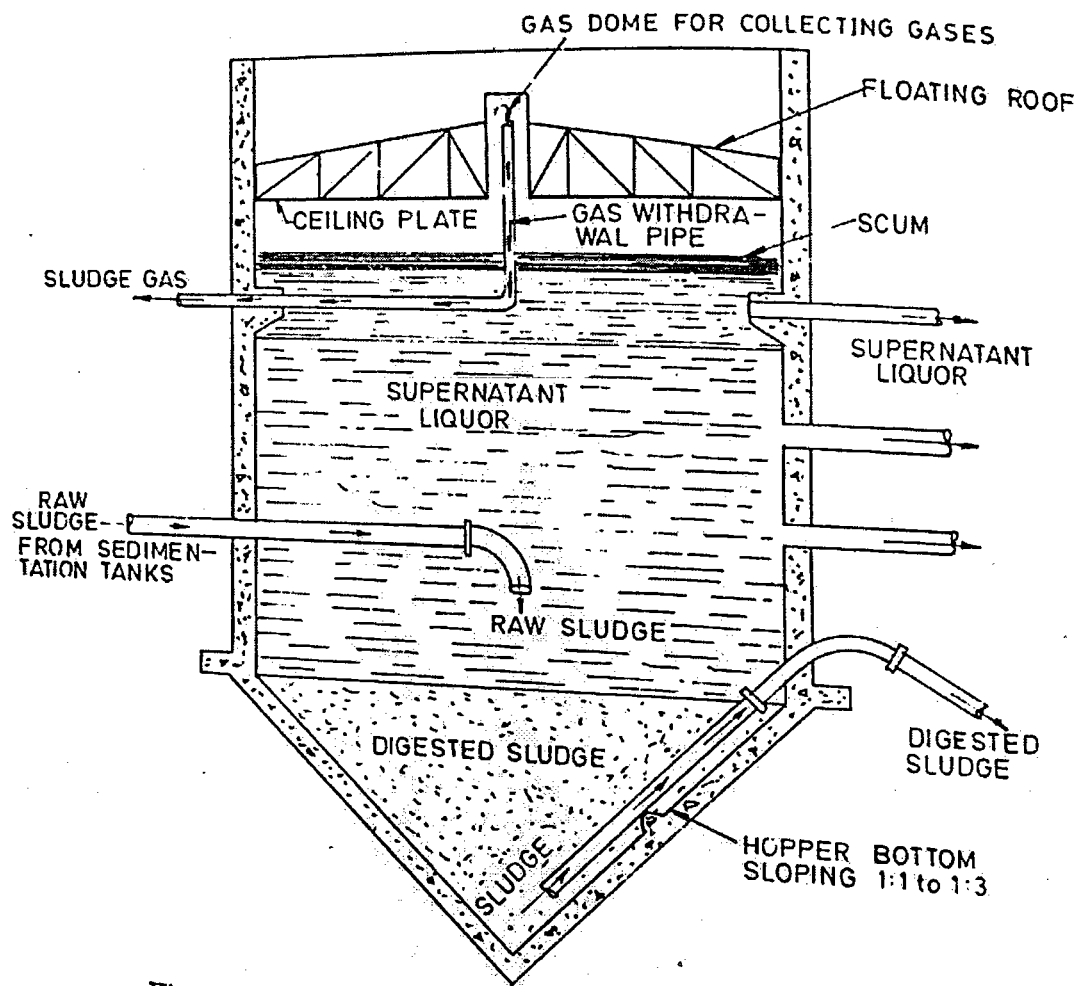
Cross-section of a typical sludge digestion tank.
